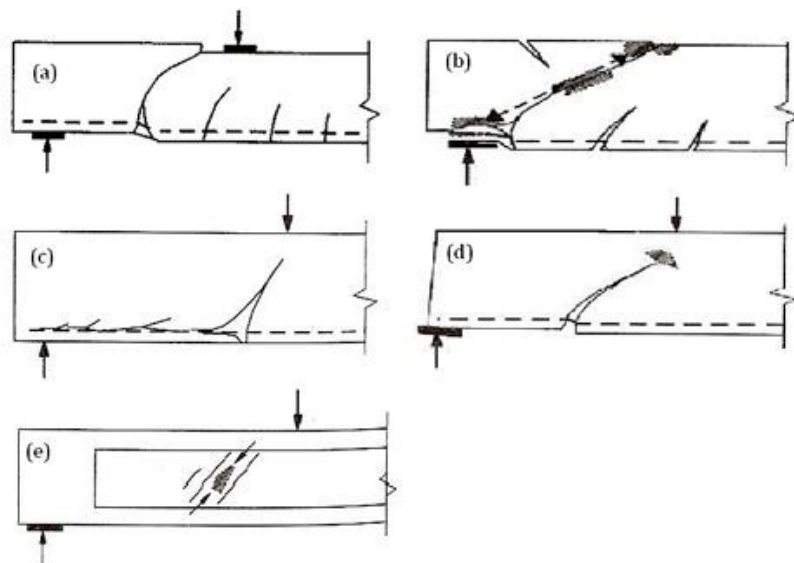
Shear failure modes: (a) diagonal tensions failure, (b) shear compression failure, (c) shear tension failure, (e) arch rib failure, (f) web crushing failure [34]
